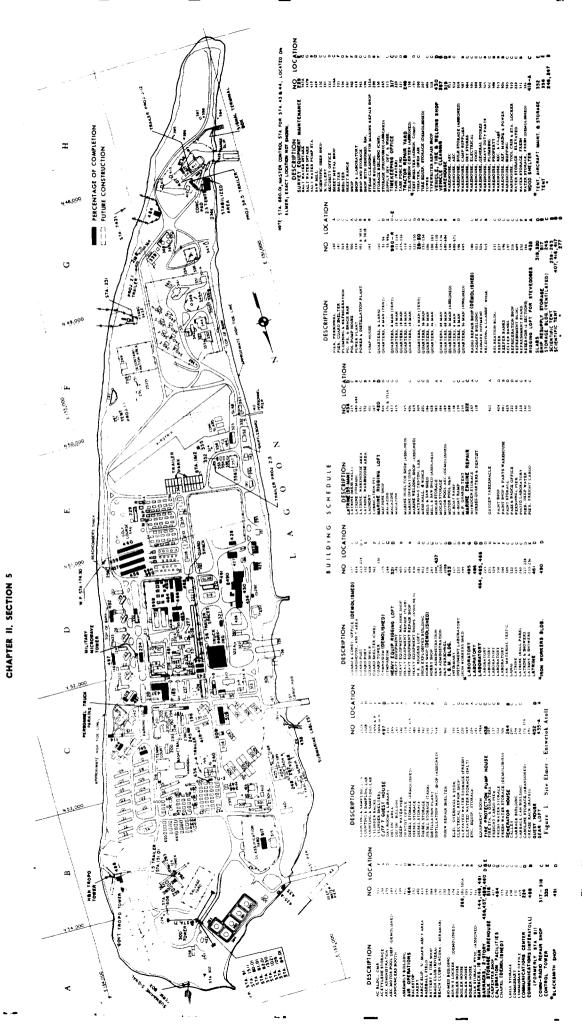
Site Elmer --- Eniwetok Atoll.
